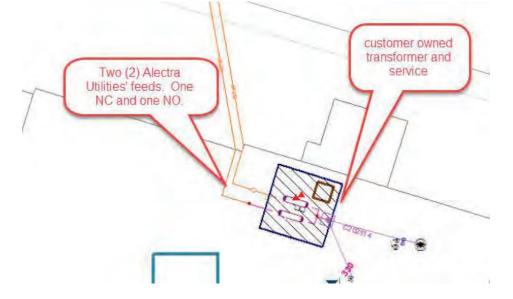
Horizon Utilities – plan showing power supply location for the 330 Wentworth Street site.
